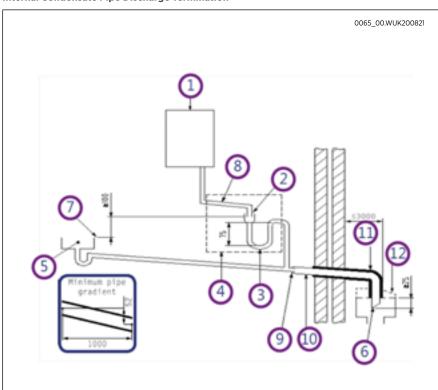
Connection of a condensate discharge pipe downstream of a sink, basin, bath or shower waste trap.
